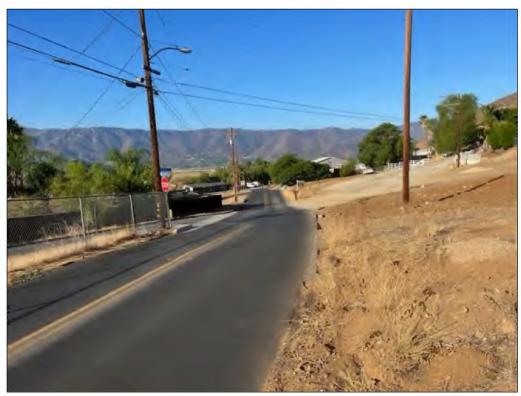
Country Club Boulevard, looking southwest. Photo taken 8/29/22.
